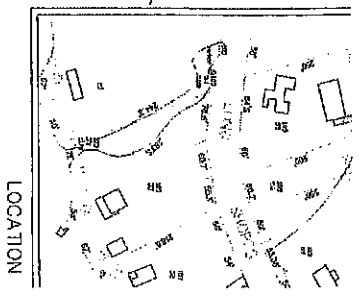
DETAILED PLOT PLAN WILL BE COMING FROM MJS ENGINEERING WHEN THEY
